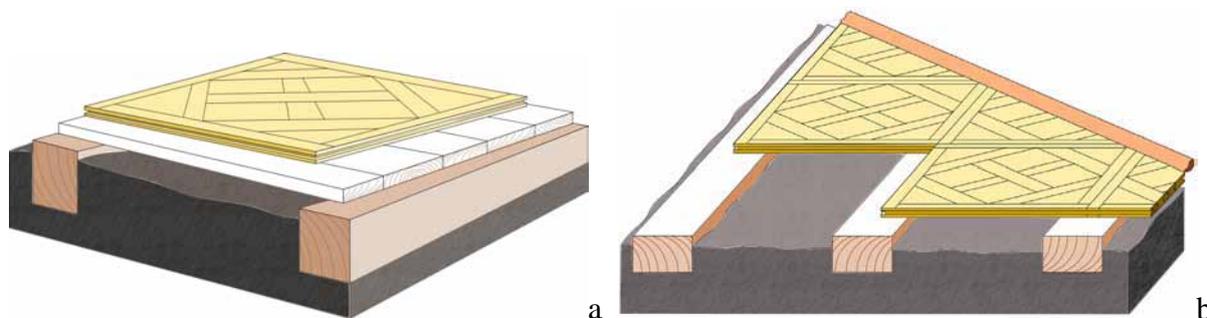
Tarnowiec manor house floor structure plan: a – flooring located on boarding and on beams; b – flooring lying directly on beams
